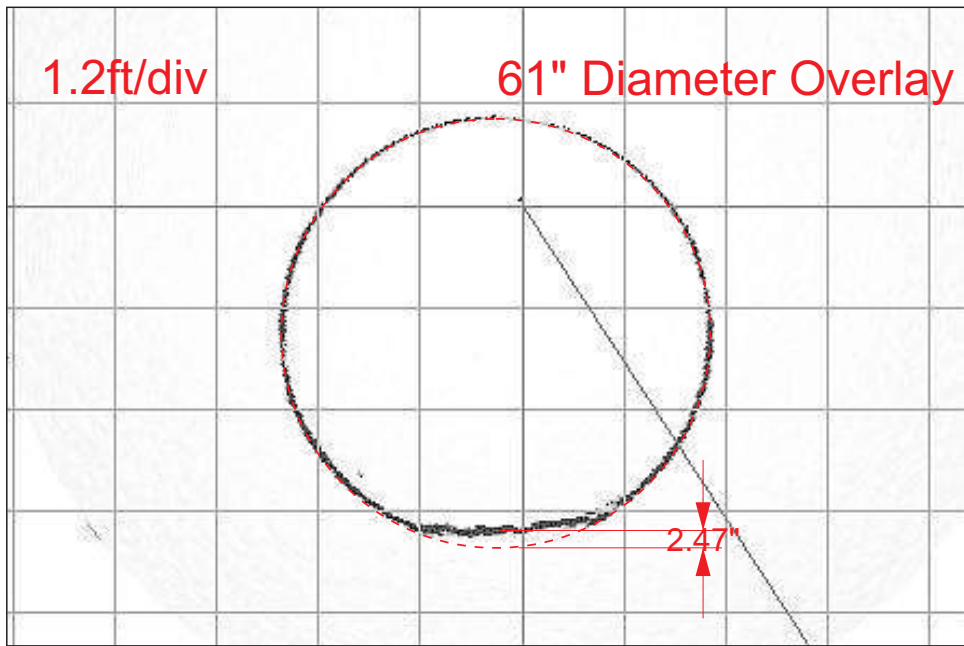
B-3: Sonar Profile 25 - 45 feet downstream of Manhole 3.
